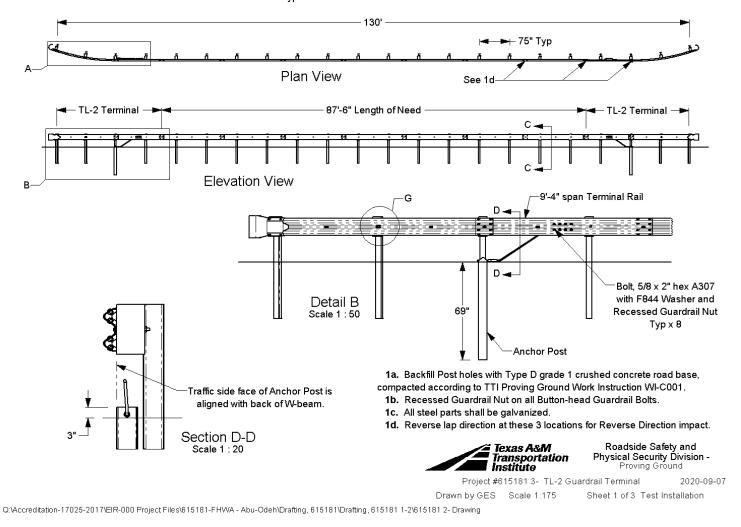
Details of TL-2 Terminal on MGS for Crash Test 615181-01-2.
